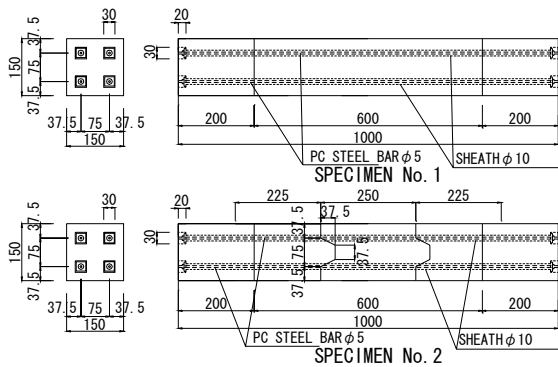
Dimensions and basic structure Specimens of the Test series 1
